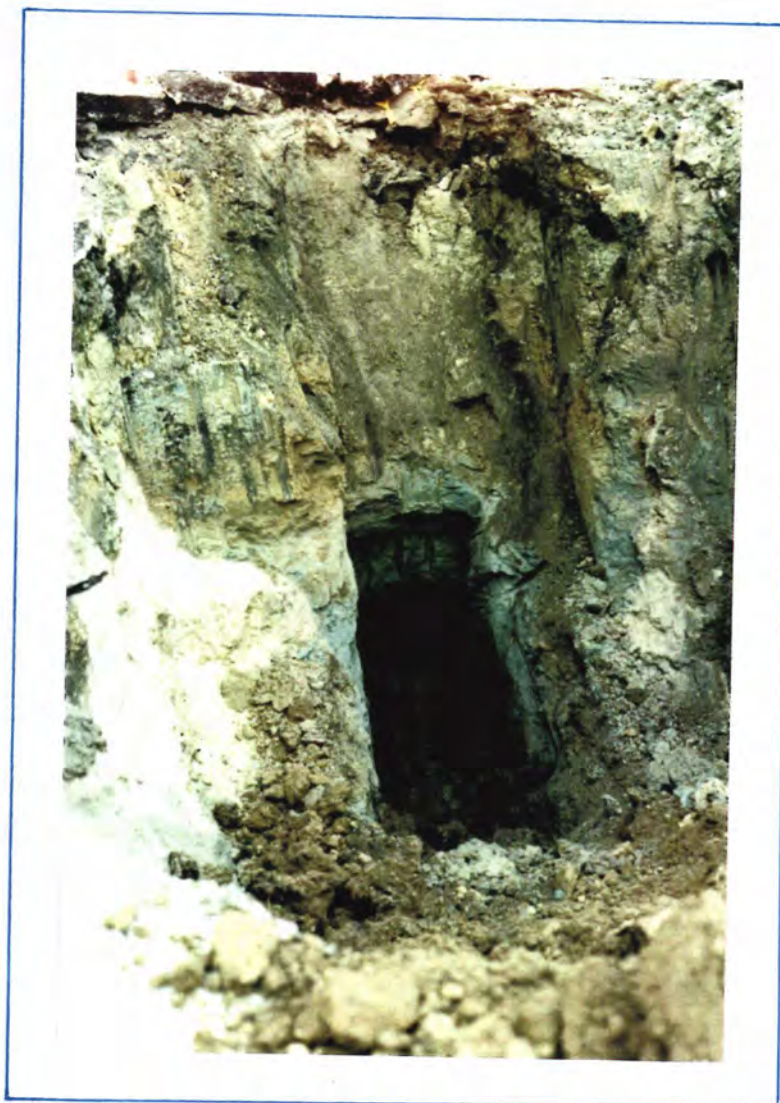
East end of excavation after samples were taken from 17 feet. Sample analysis indicated that contamination was not present at this depth.
